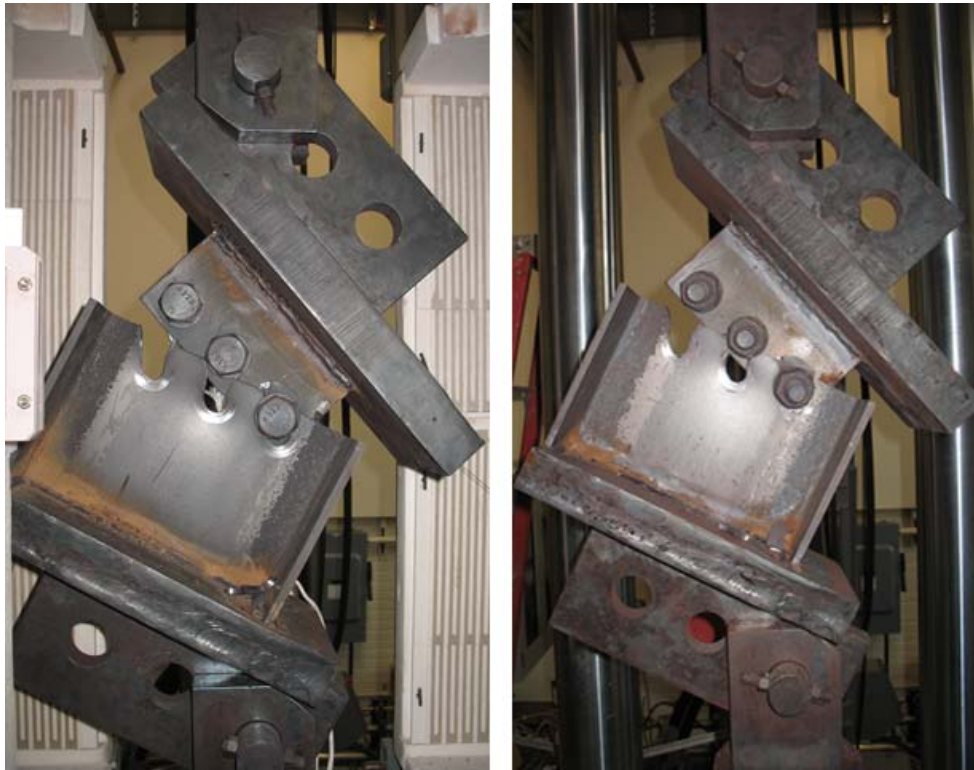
Connection failures after inclined tension tests at 400°C (left) and 500°C (right) – 1 inch A325 bolts
